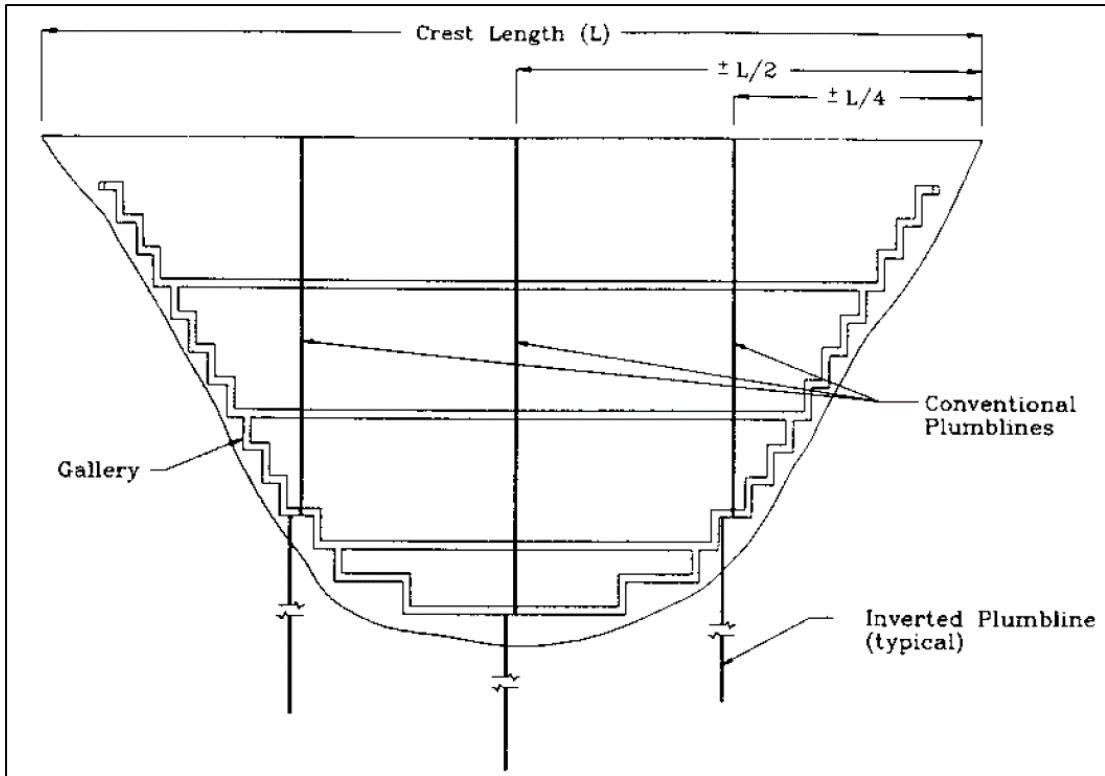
Typical layout of plumblines in an arch dam (USACE, 1995).
